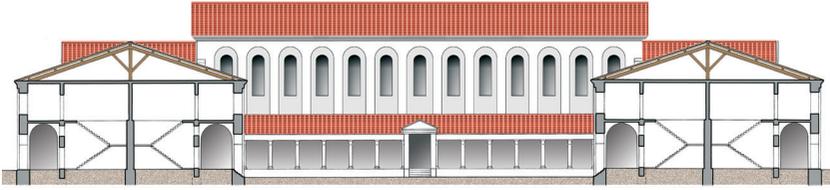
Reconstruction drawing of the Forum basilica with sectional view of the storage buildings. © G. Precht, LVR-APX.
